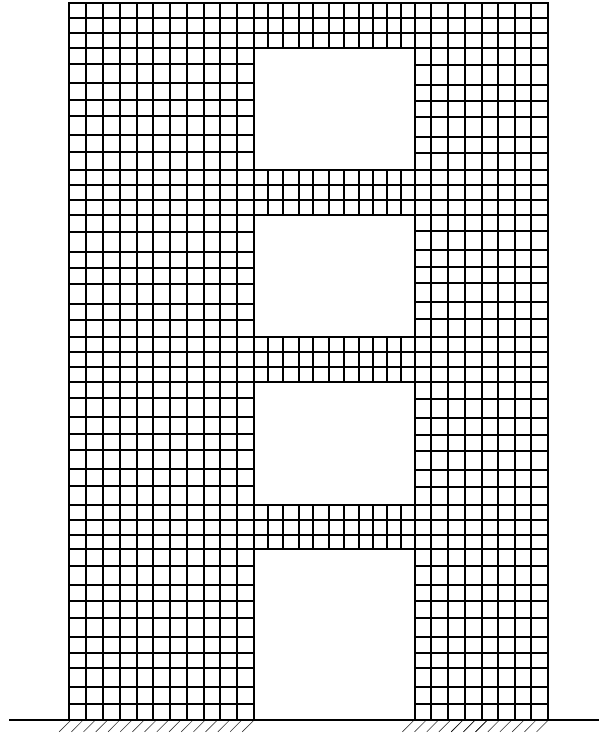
Finite Element Model of a Coupled Shear Wall
